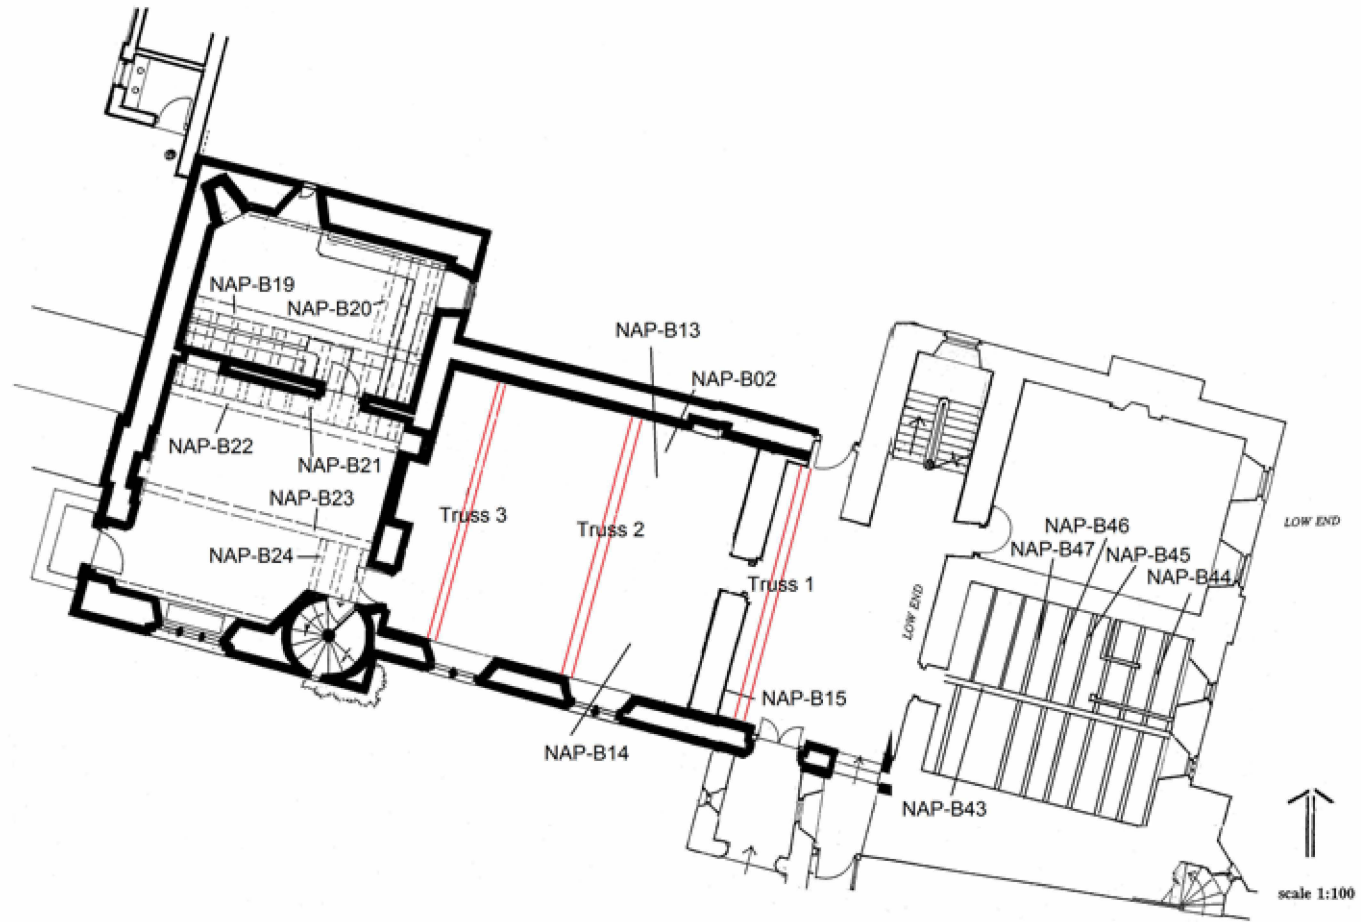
North range, ground-floor plan showing the location of samples NAP-B02, NAP-B13–15, NAP-B19–24, and NAP-B43–47 (John Warren)
